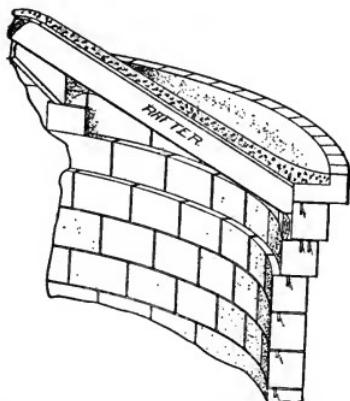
Illustrating how to build cornice for concrete roof on a concrete block silo.—Courtesy Nebraska Station.
